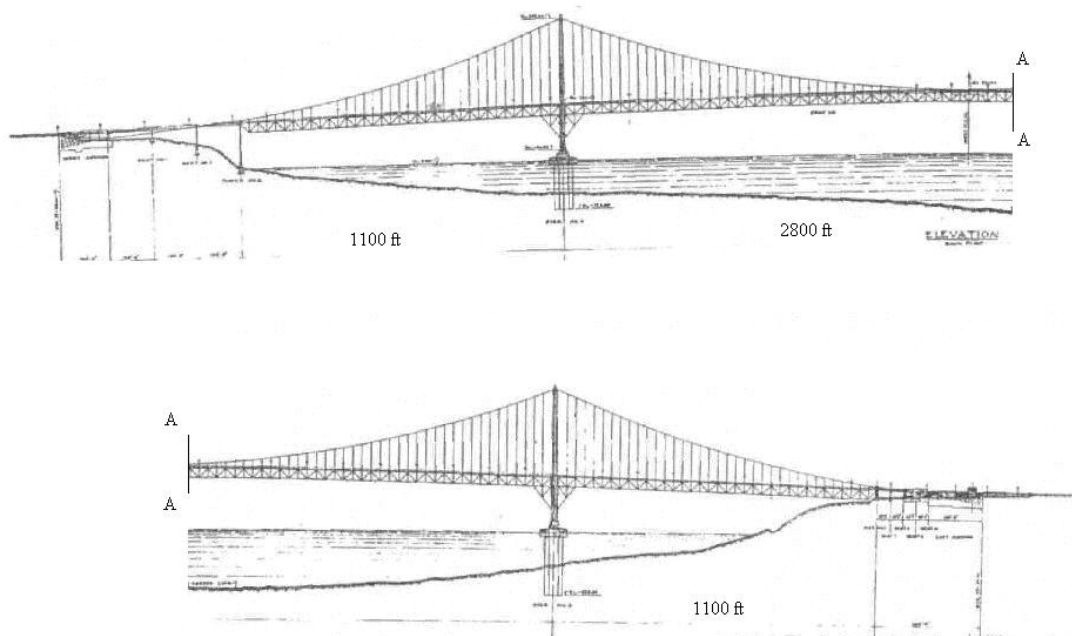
Existing Tacoma Narrows Bridge Elevation View.
